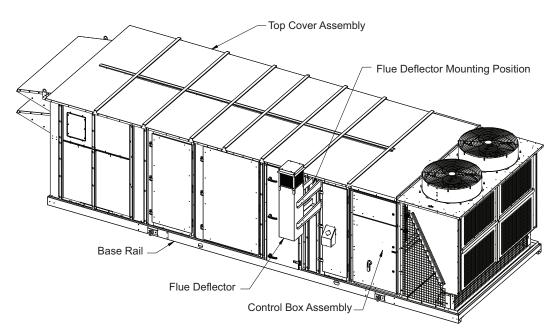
Flue Discharge Deflector Mounting Position (Low Heat)
